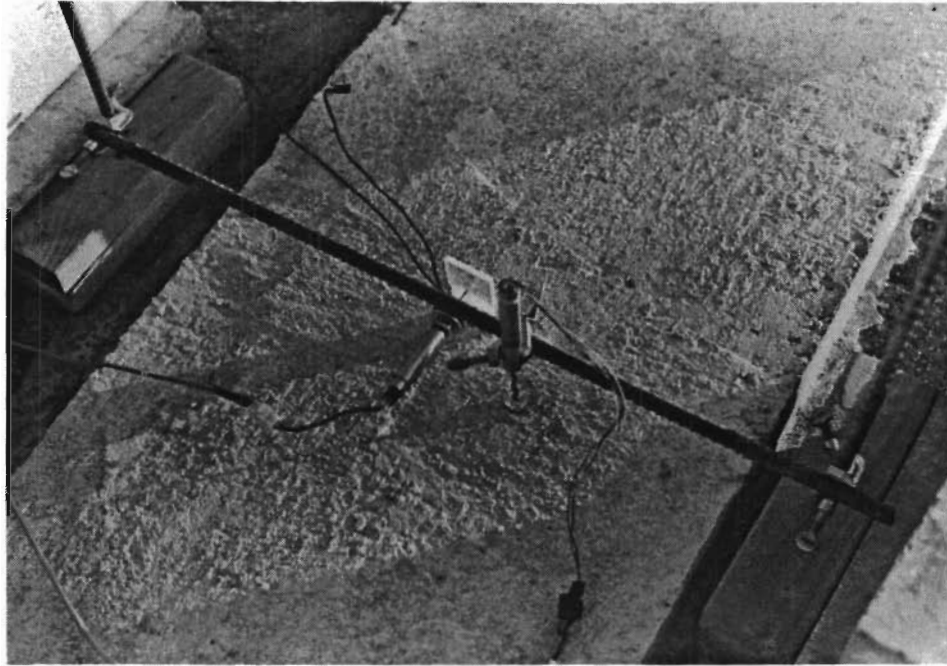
Horizontal and vertical LVDT's on a 3-1/2-inch test slab.
